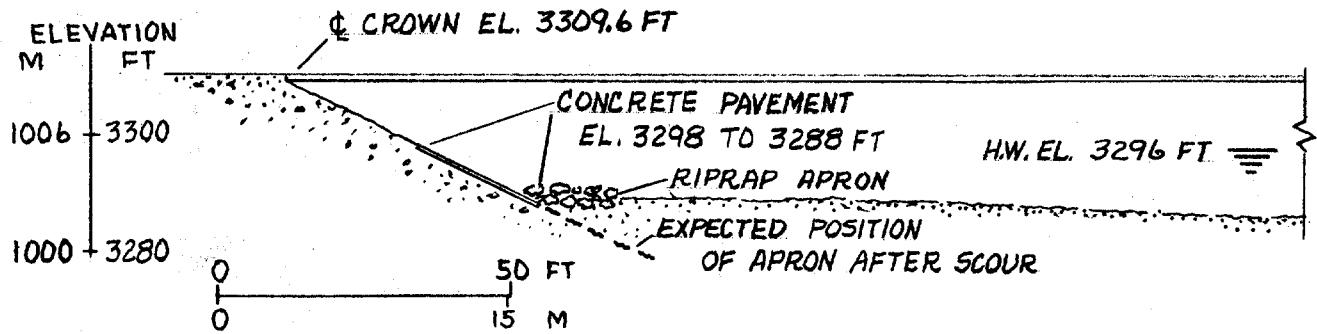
Elevation sketch of left abutment, PH-587 bridge.
